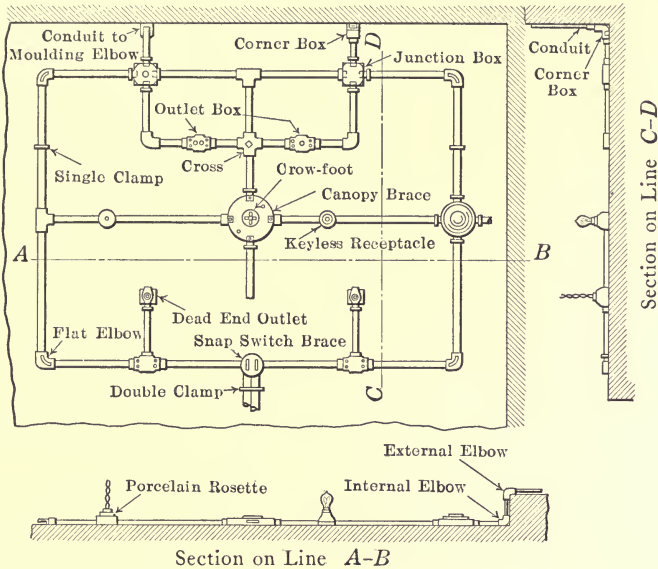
APPLICATION OF METAL MOLDING AND FITTINGS.
